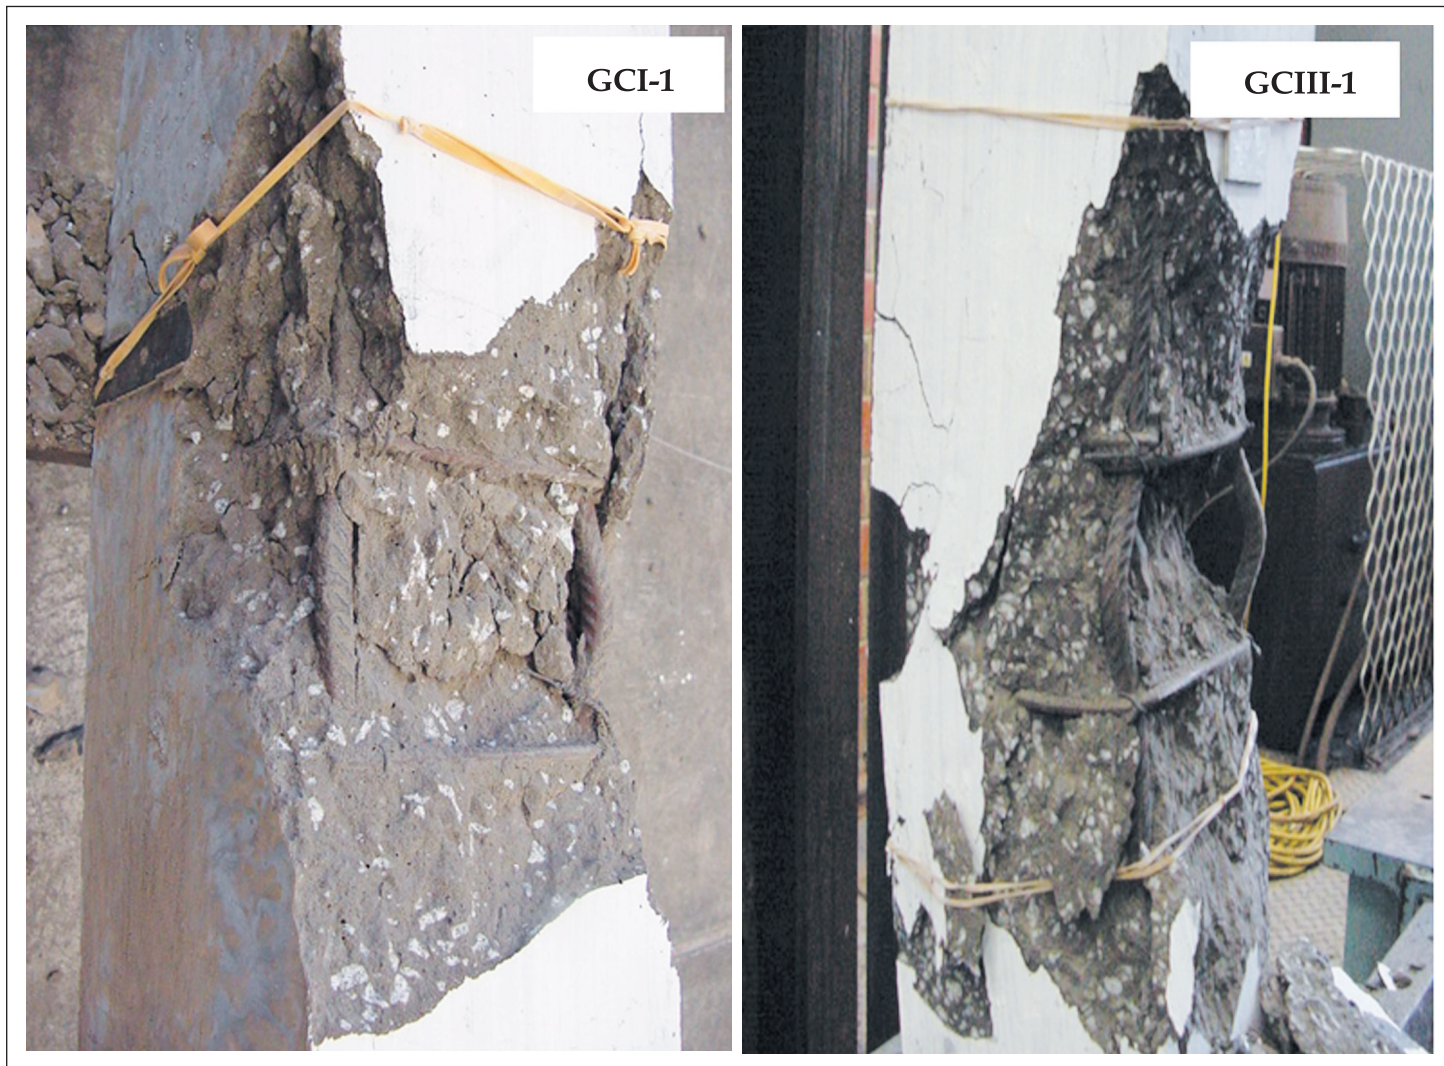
Failure Mode of Reinforced Geopolymer Concrete Columns [13]
